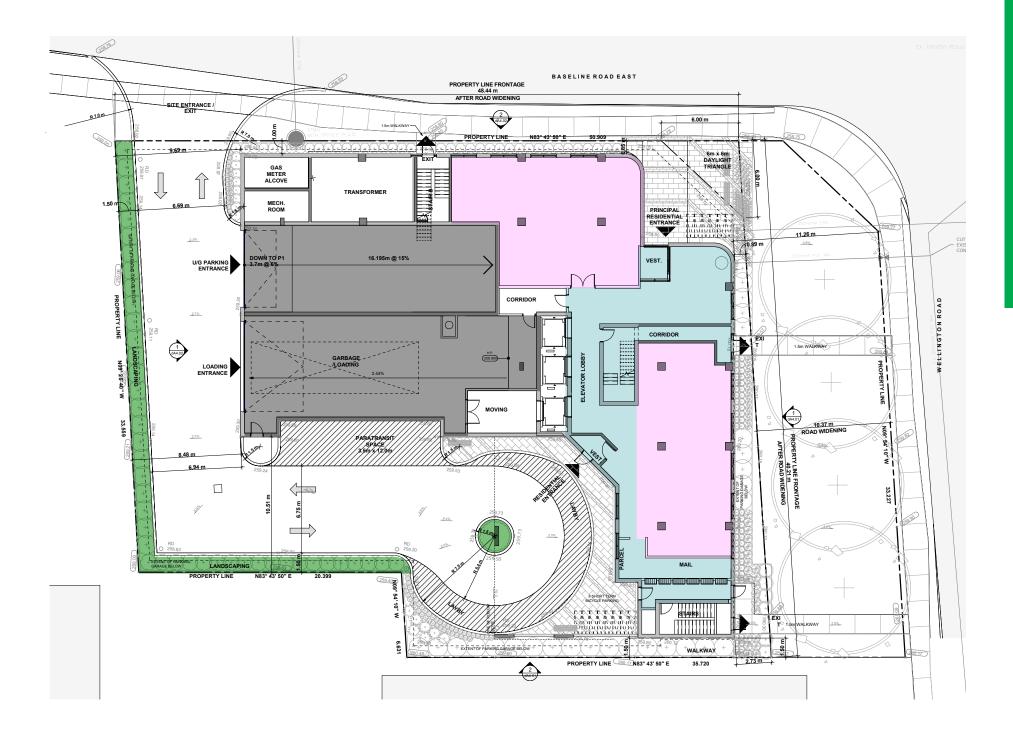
Site Plan prepared by Kirkor Architects and Planners
